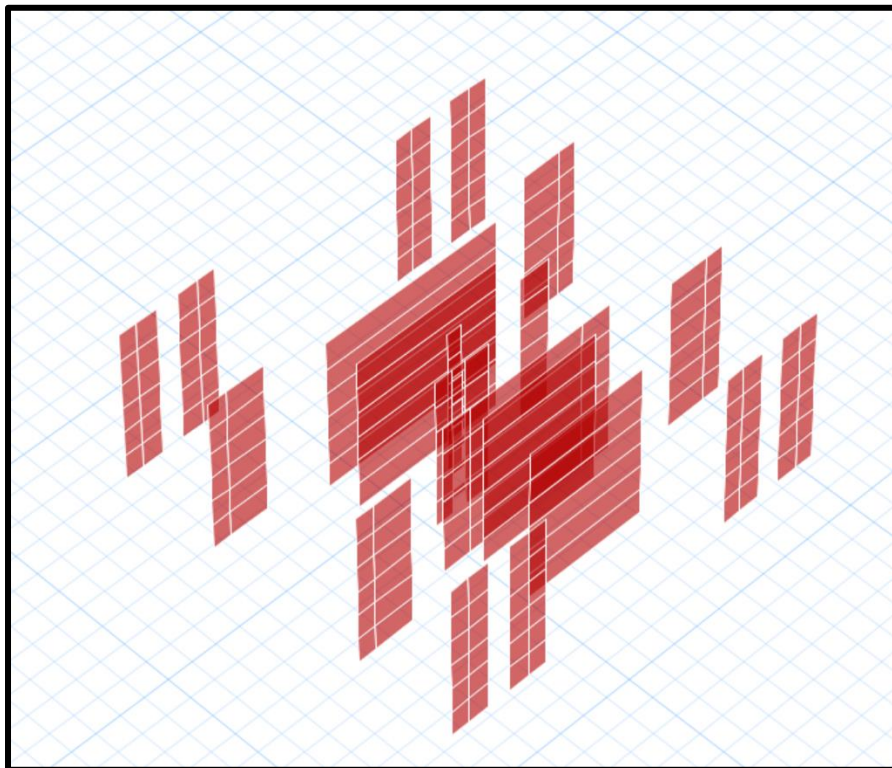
3D View of Basement Floors Shear Walls to be Assigned
